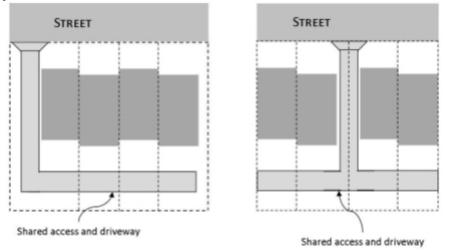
F.2.b <u>Townhouse</u> Rowhouse Development with Corner Lot Access
